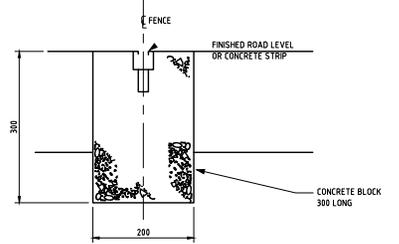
1 K SUPPORT CABLE RUN 5302,5303 (TYPICALLY FOR BARBED WIRE)
